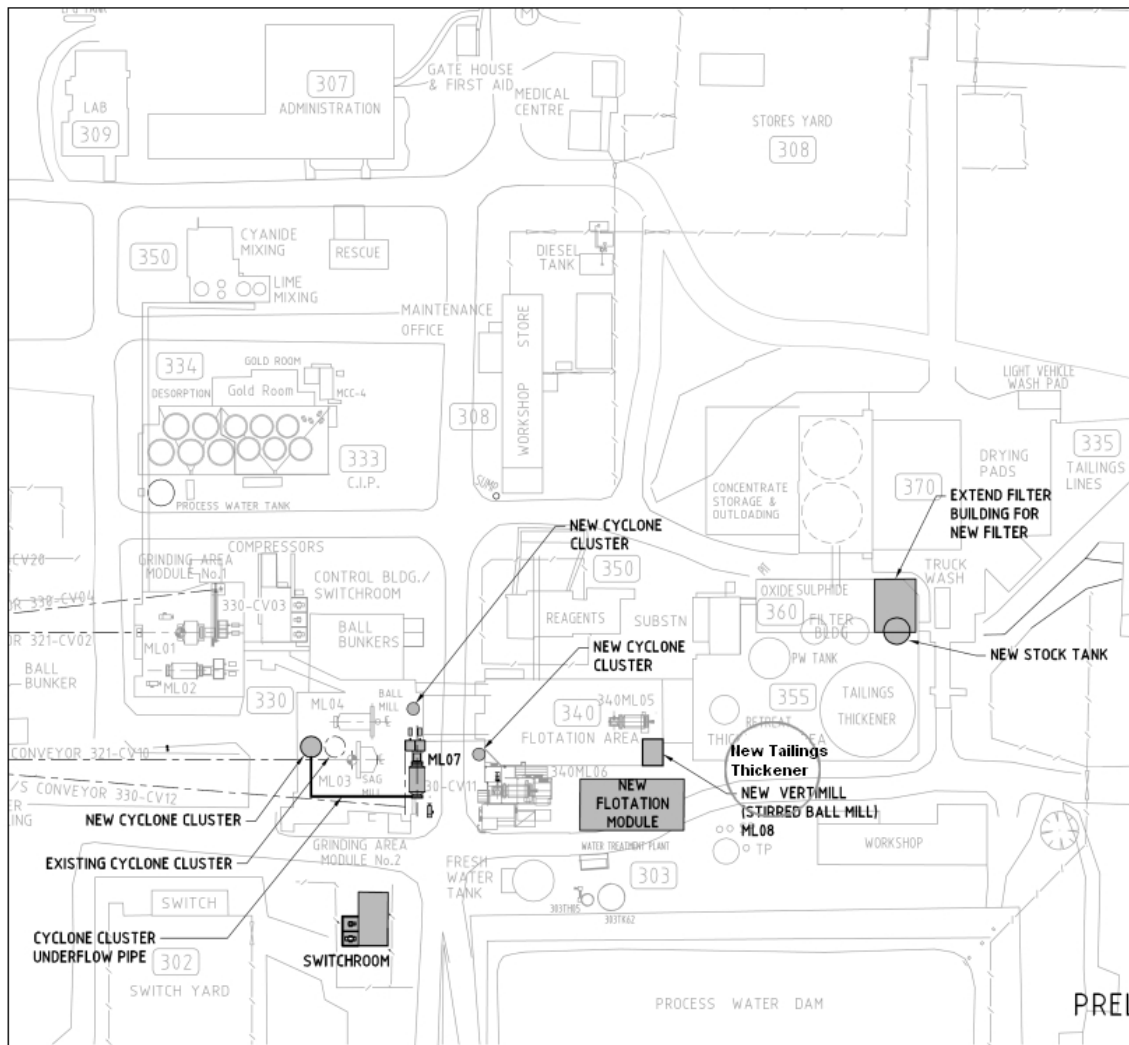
Proposed Upgrades for Ore Processing Plant
